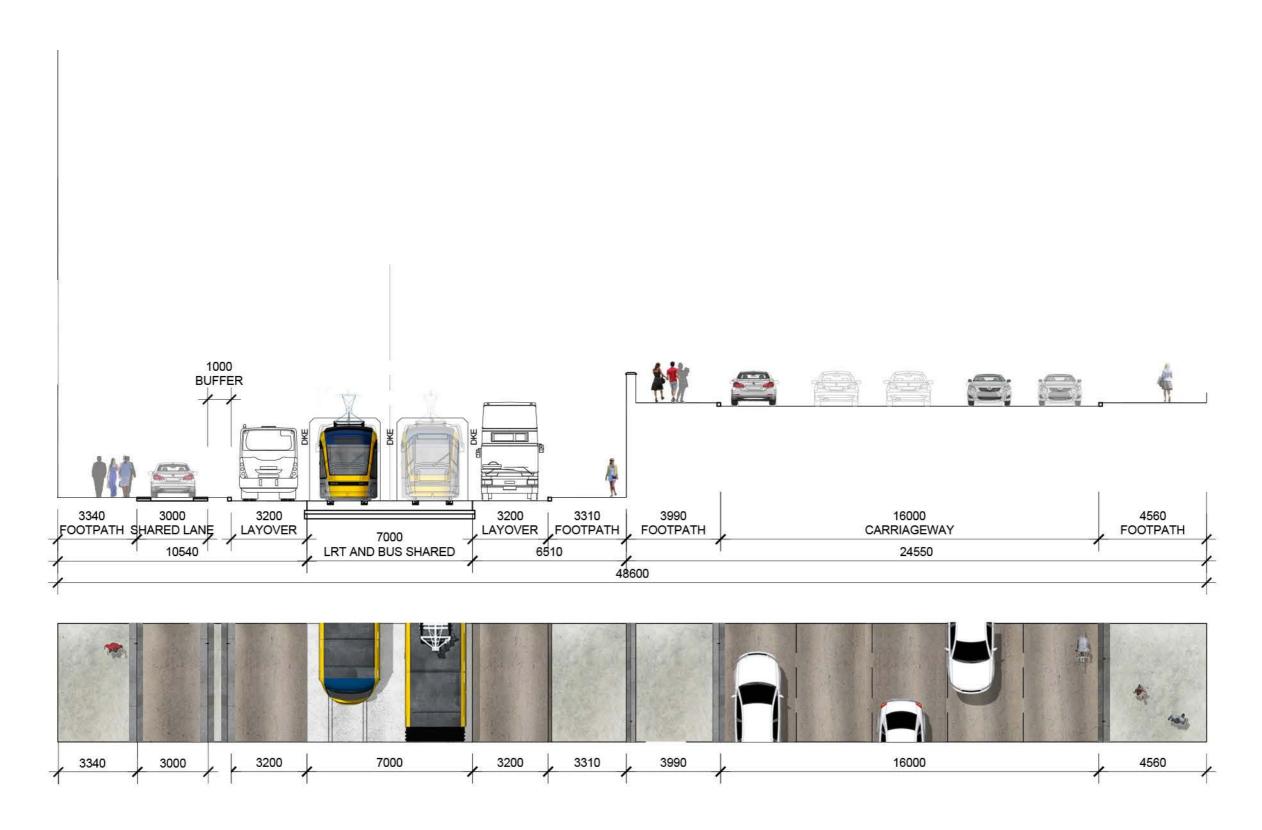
Partial plan and section of Sturdee Street looking east towards Britomart
